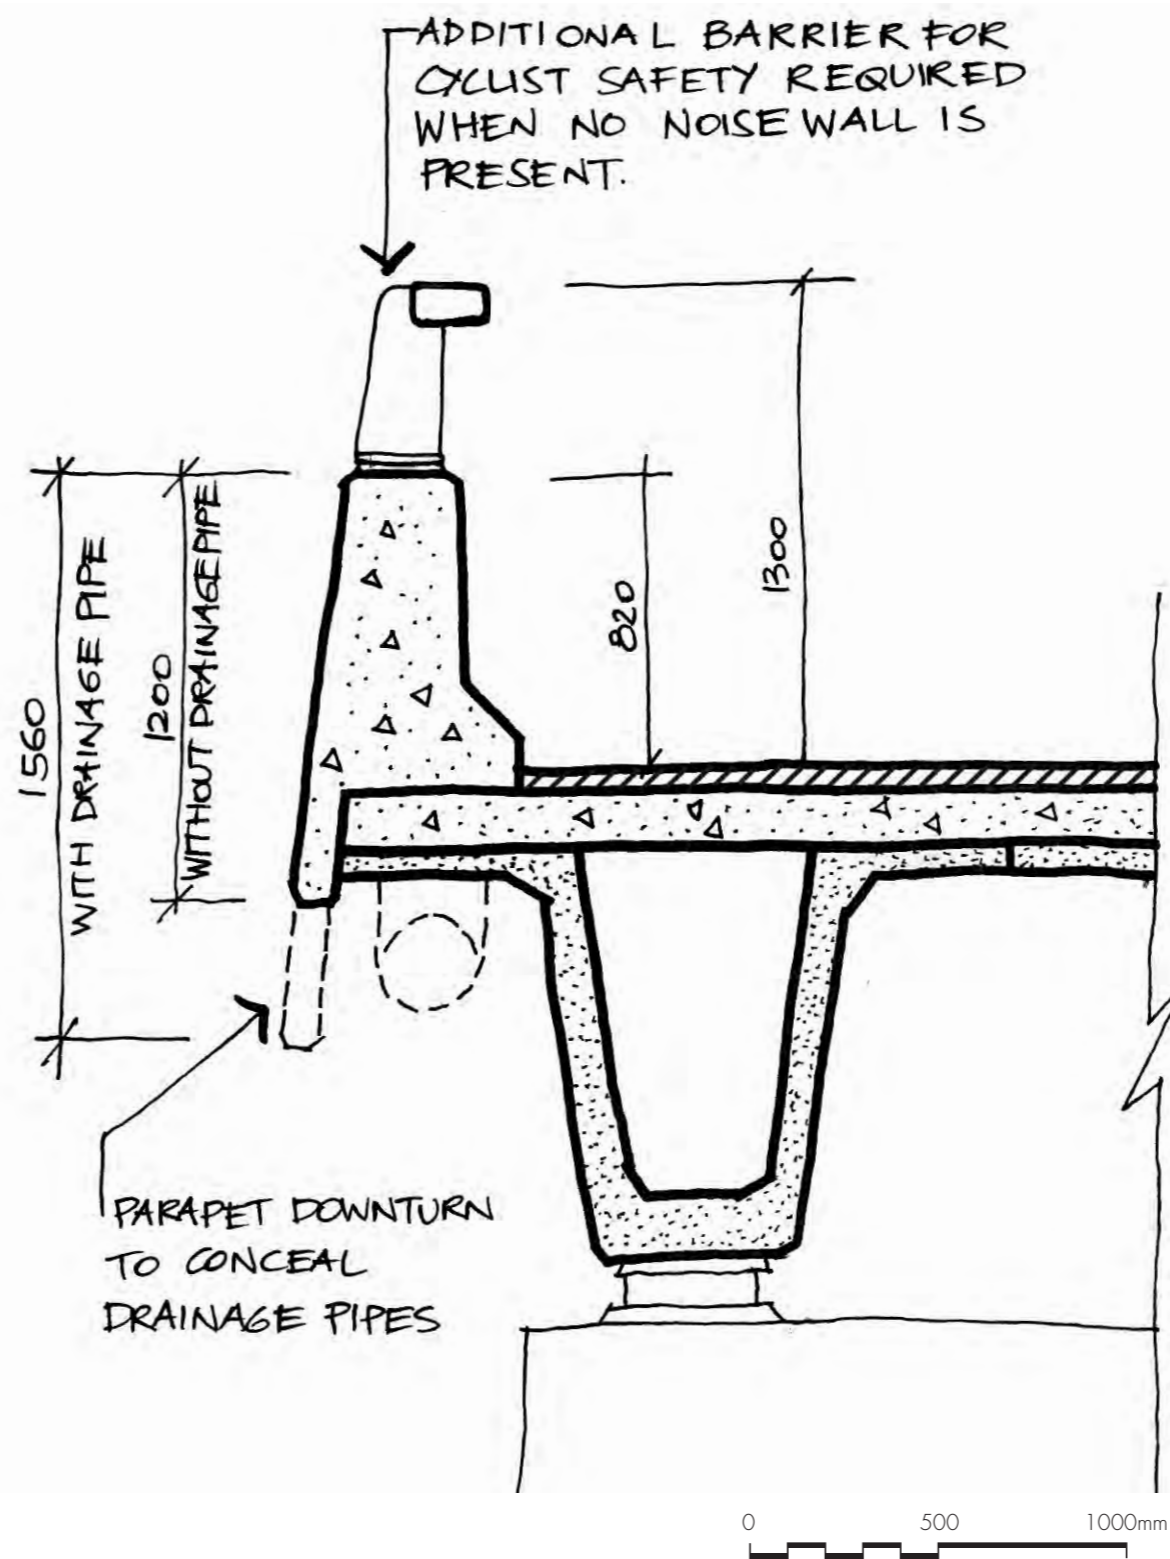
Typical Bridge - Parapet detail as used on Darling Mills Creek Bridge and Yale Close Bridge
